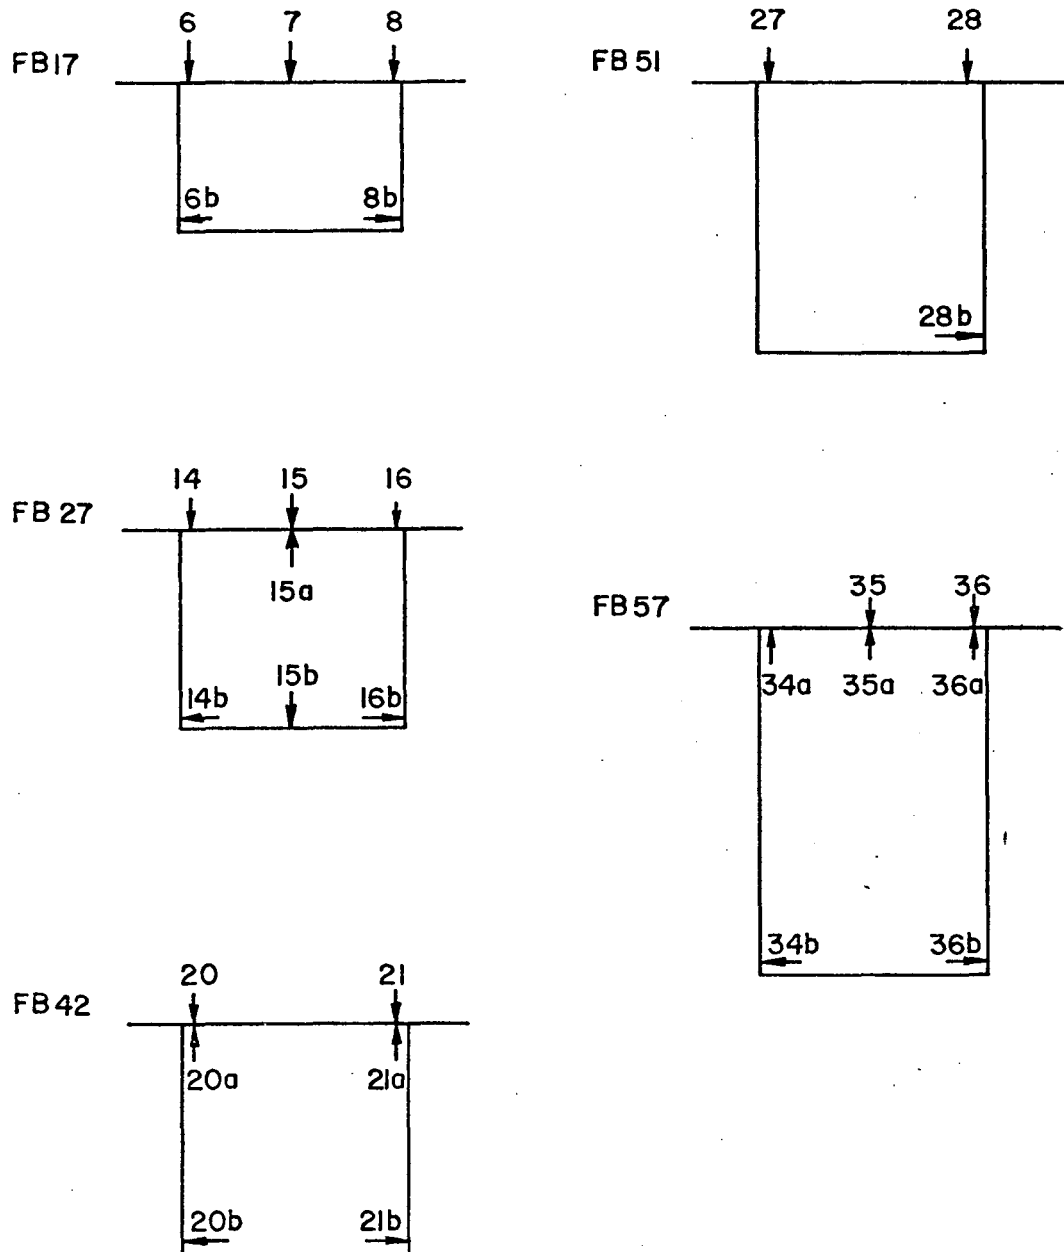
Mechanical Gage Hole Locations (South Box)
